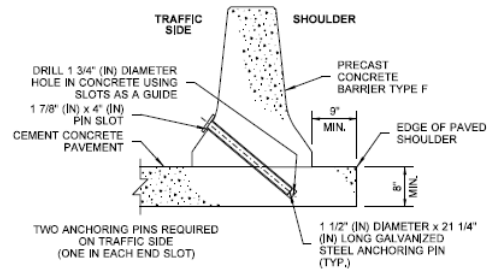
Details of WADOT Concrete Barrier Type F Precast Standard Plan C-60.10-01.
